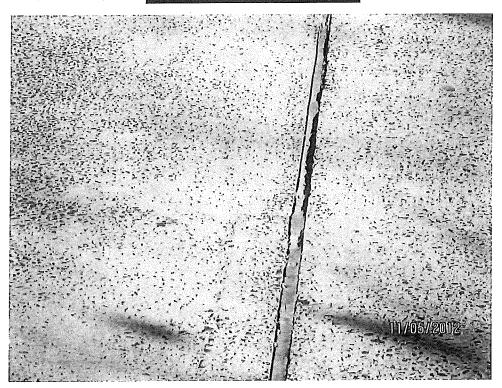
The South longitudinal joint filler showing minor settlement in several areas.
